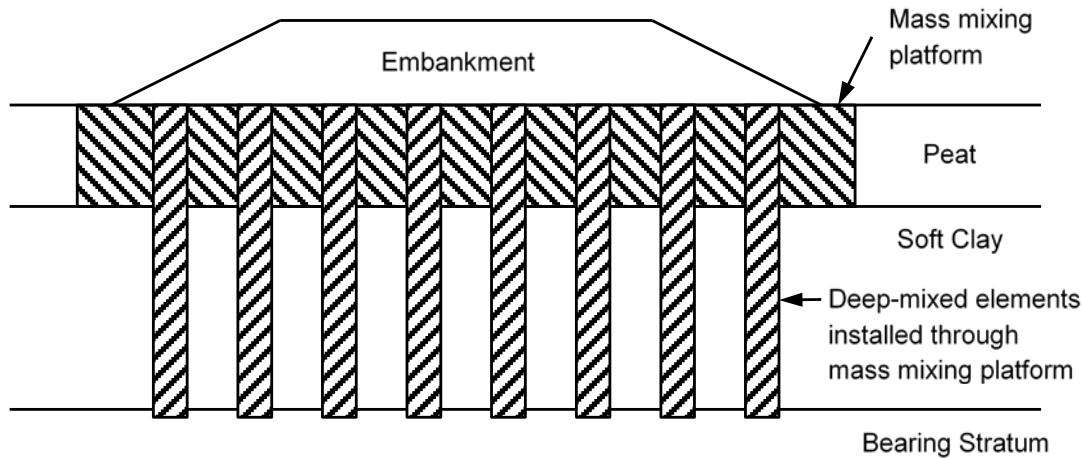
Mass mixing to create a load-transfer platform and construction working platform.
